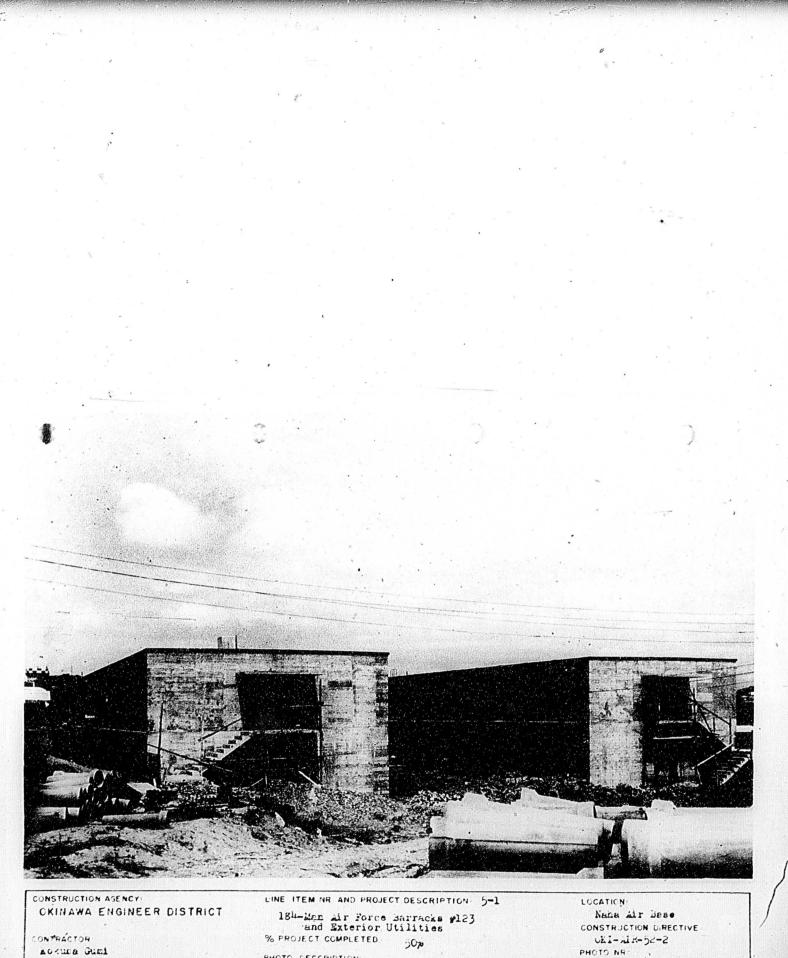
PHOTO DESCRIPTION 184-Man Air Force Barracks #123
